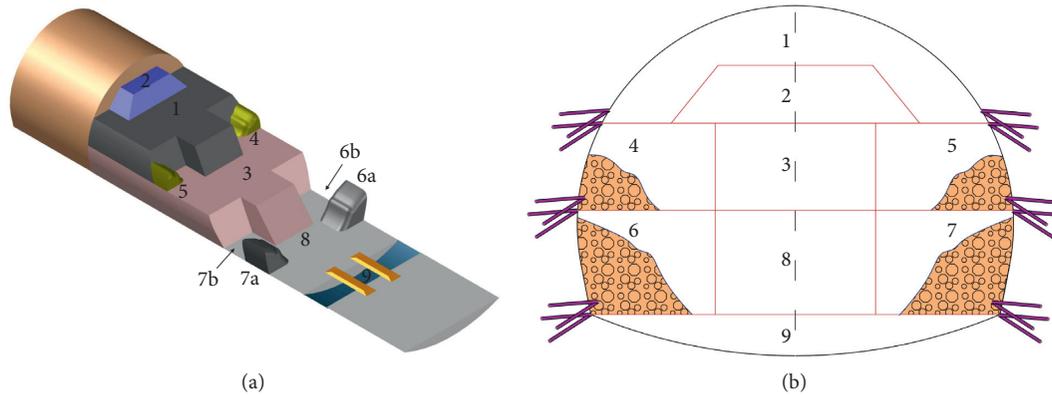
Complementary cyclic three-step excavation method. (a) Three-dimensional sketch of excavation. (b) Excavation of elevation view.
